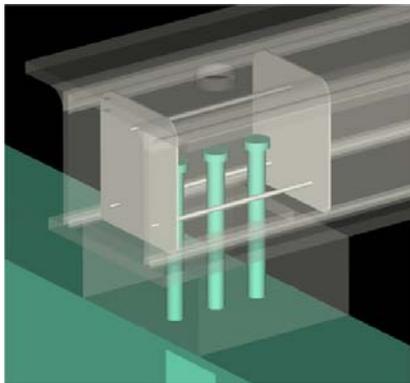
Connection of the aluminum deck to the top flange of the steel girder
